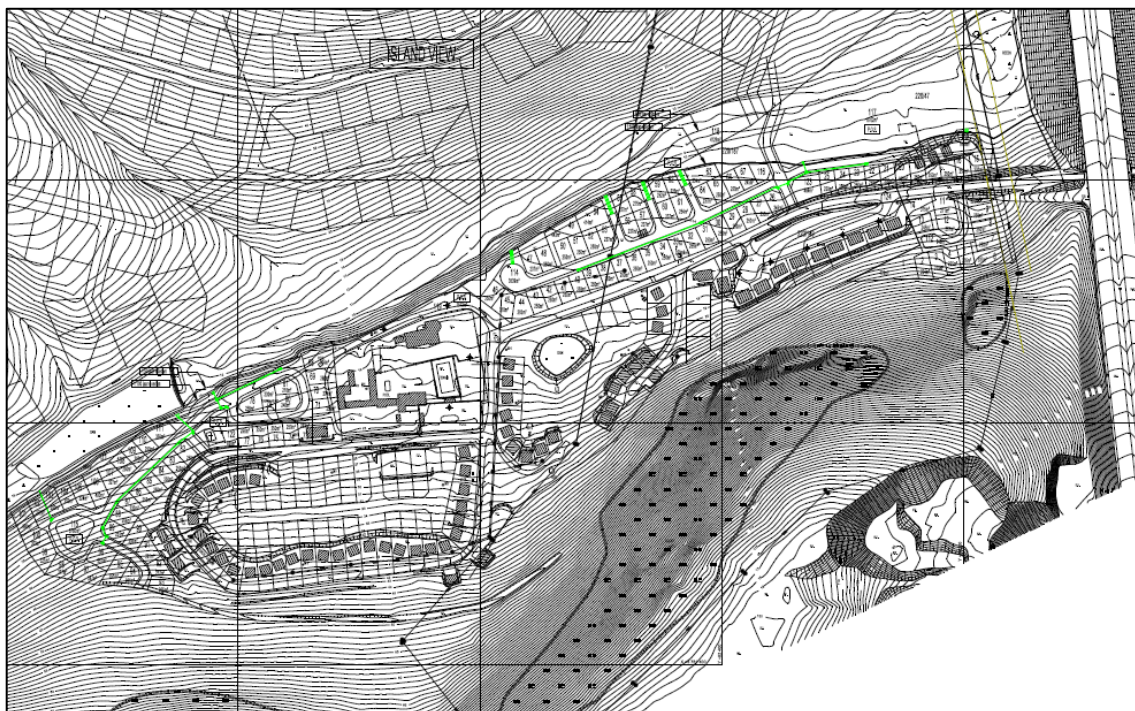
EXTRACT OF ROADS & STORM WATER PLAN COMPILED BY V3
